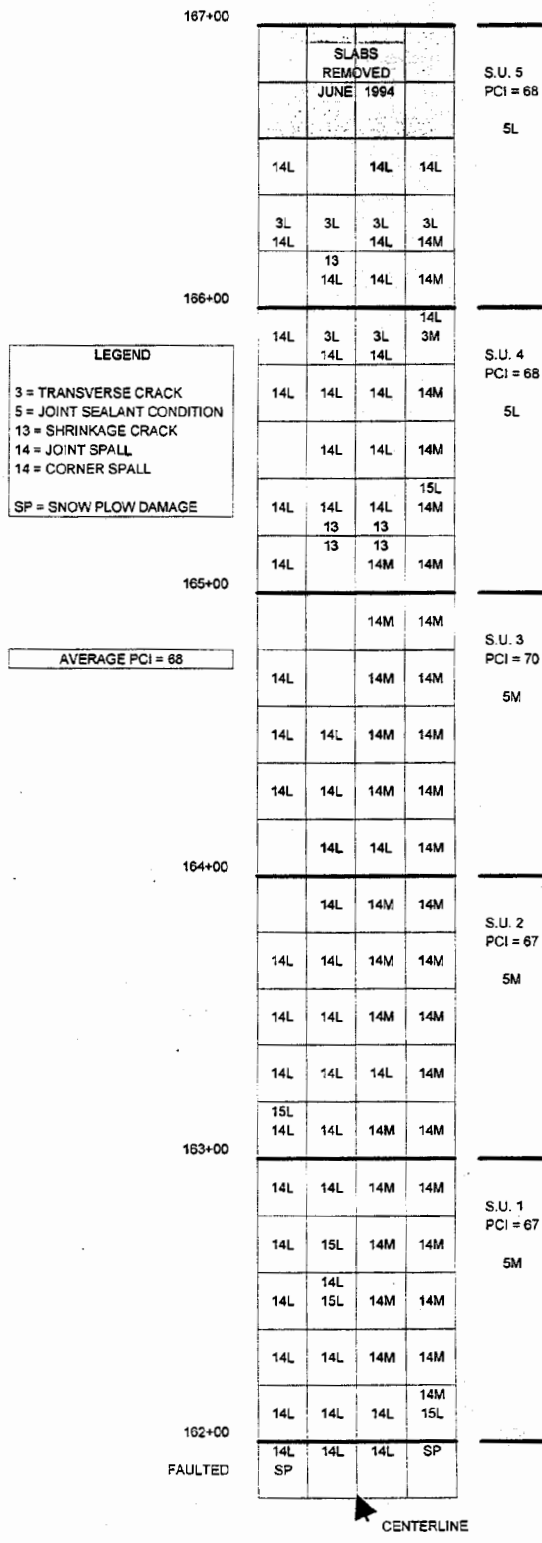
PAVEMENT CONDITION INDEX SURVEY—CONVENTIONAL PCC PAVEMENT, FALL 1997
